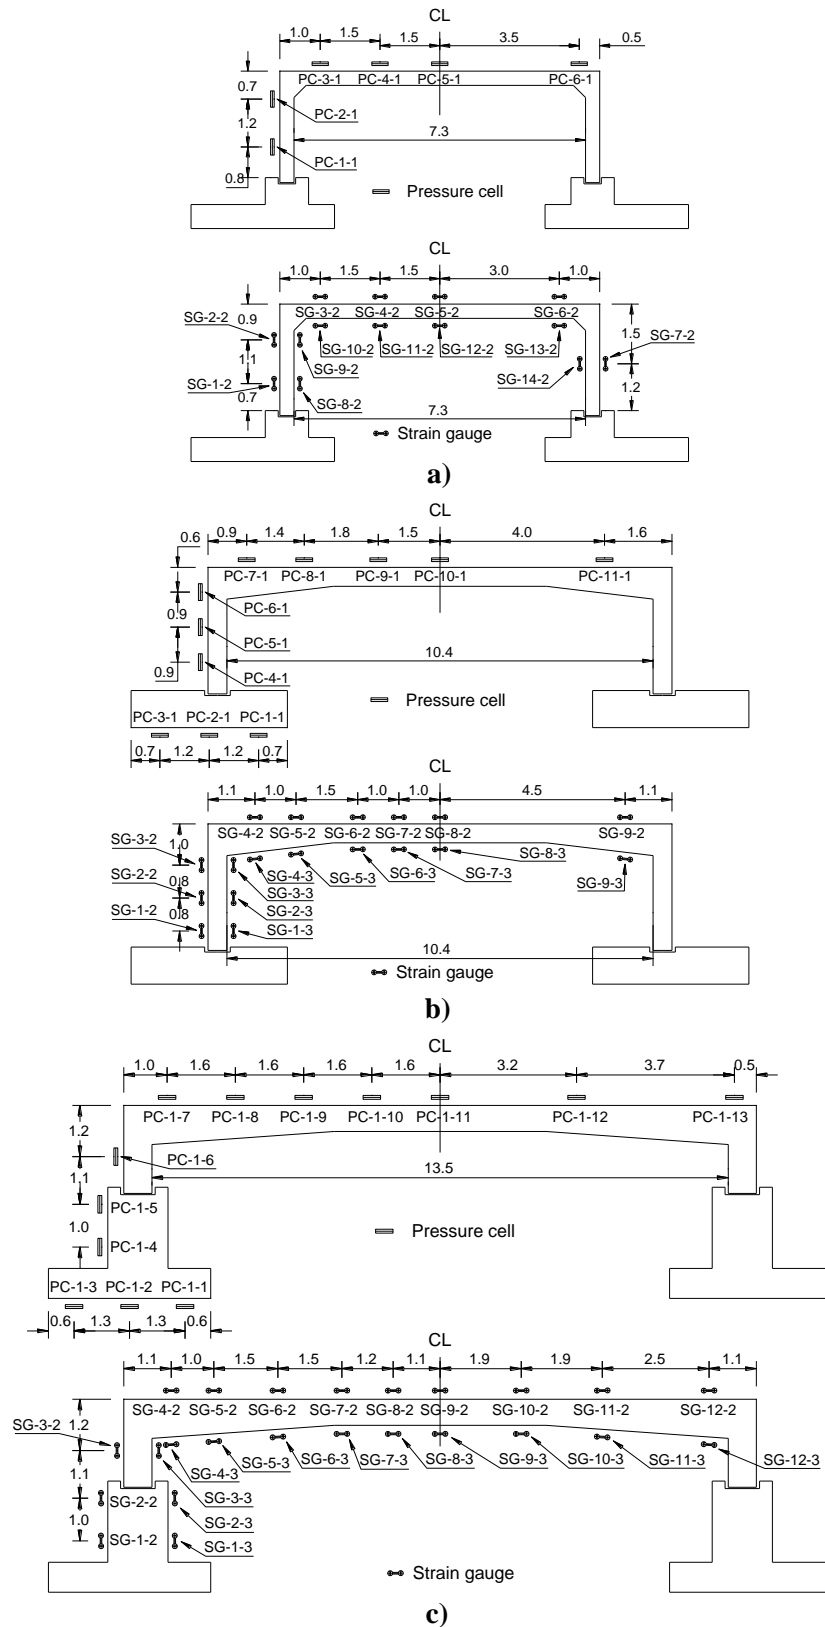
Culverts' instrumentation layout: a) Remembrance culvert; b) Pickering culvert; and c) Oshawa culvert. (All dimensions are in m)
